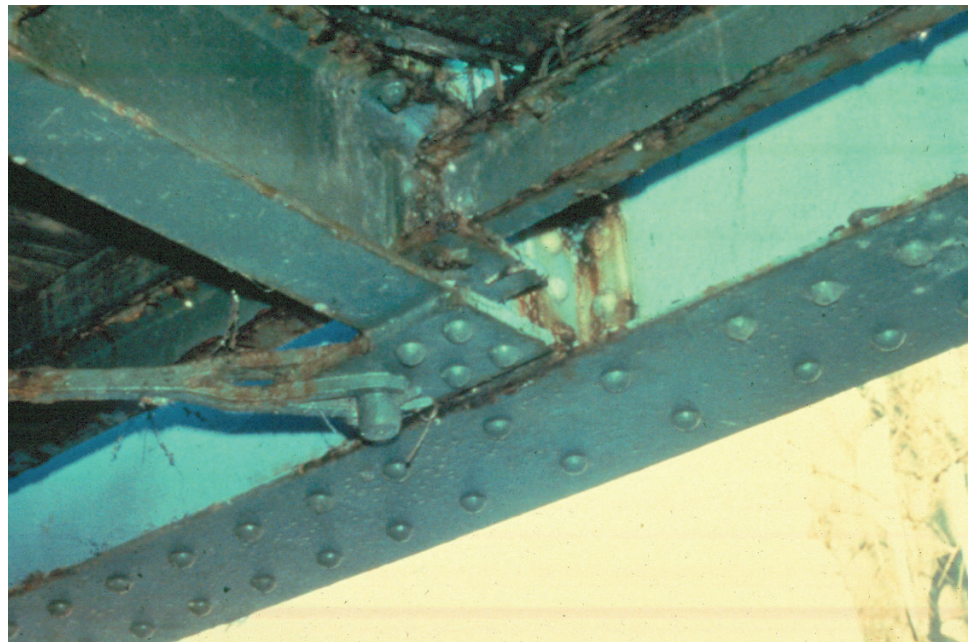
Lateral Bracing Connection on a Through Girder Bridge
